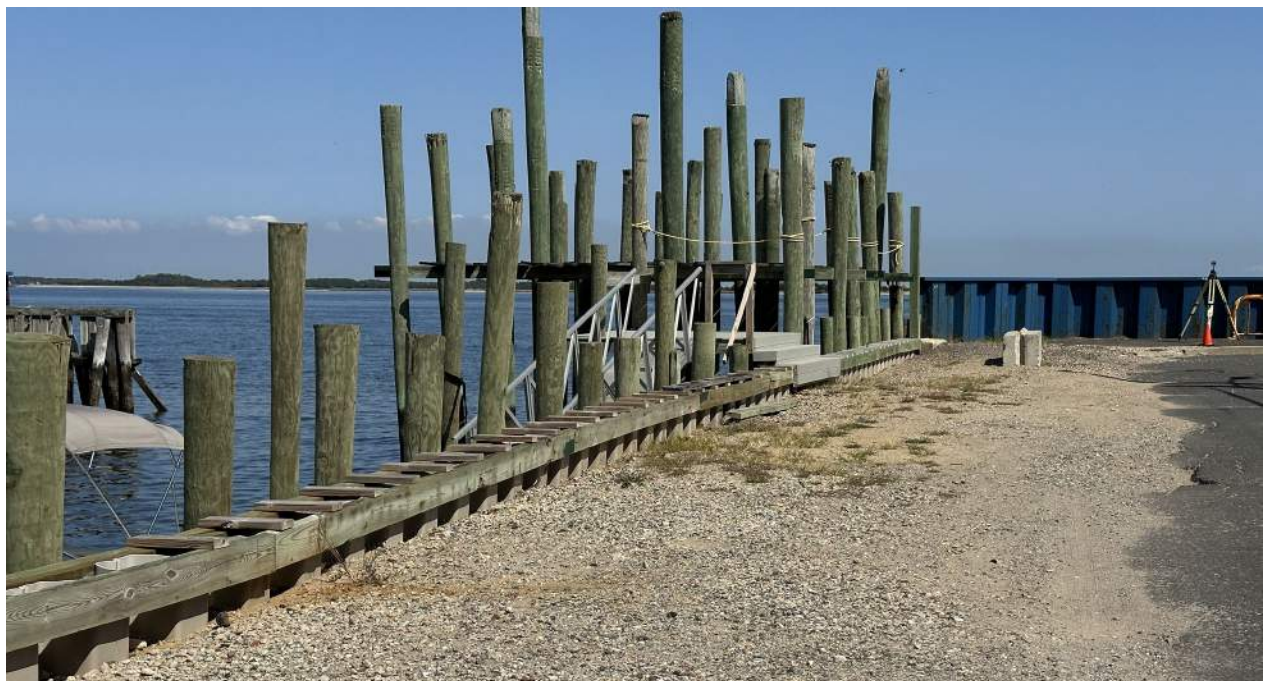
Section D, Easternly Dock, Viewed from Grade from Easternly Side
